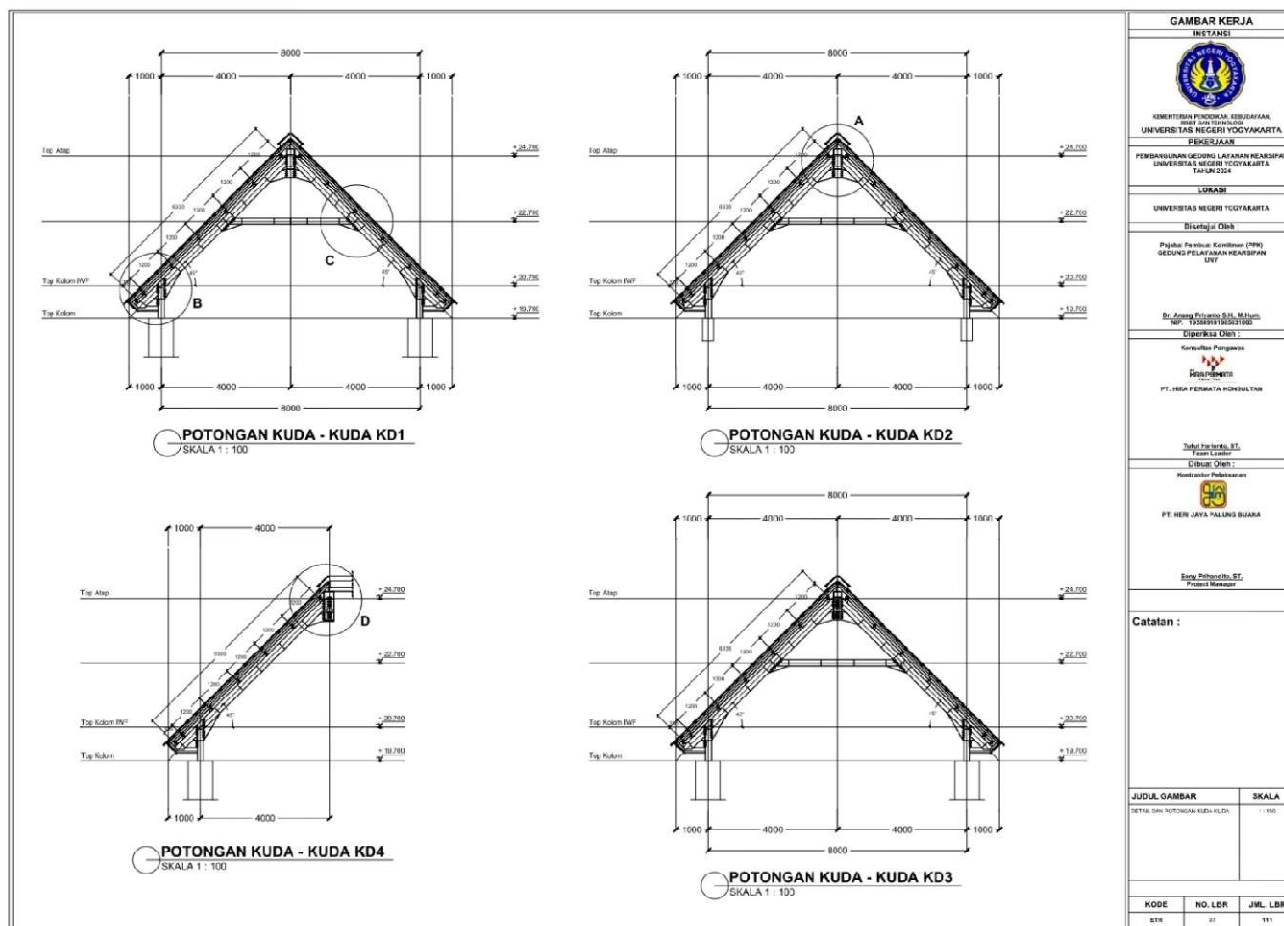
39 Cross-Section of Roof Truss KD1, KD2, KD3, and KD4
